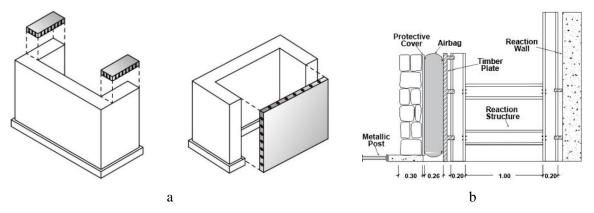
Load configuration (a) and test setup configuration (b) adopted for the out-of-plane test At the top surface of the transversal walls, two steel profiles were placed in order to even the vertical load applied through two vertical hydraulic actuators. These actuators were placed between the steel profiles and the reaction slab, see Figure 10-a. A vertical load of 10 kN, corresponding to a normal compressive load of approximately 0.05 MPa, was applied in each transversal wall. Two steel posts were placed at the back of the transversal walls between the concrete base and the reaction slab to avoid
